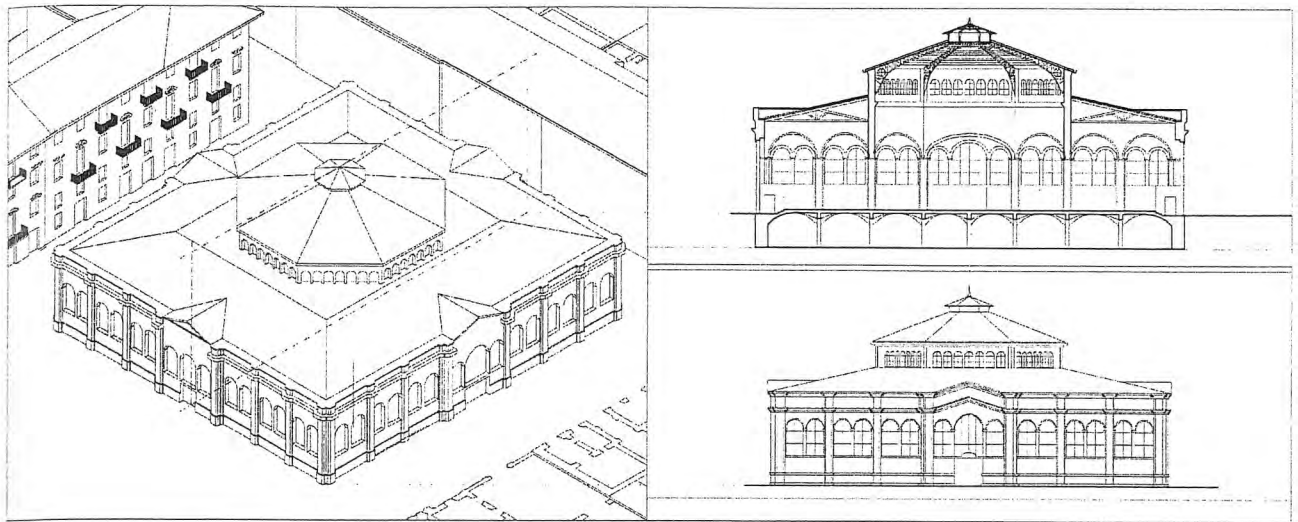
2D and 3D reconstruction of the pavilion for market and wash-house, (Drawing and model by Roberta Spallone)
